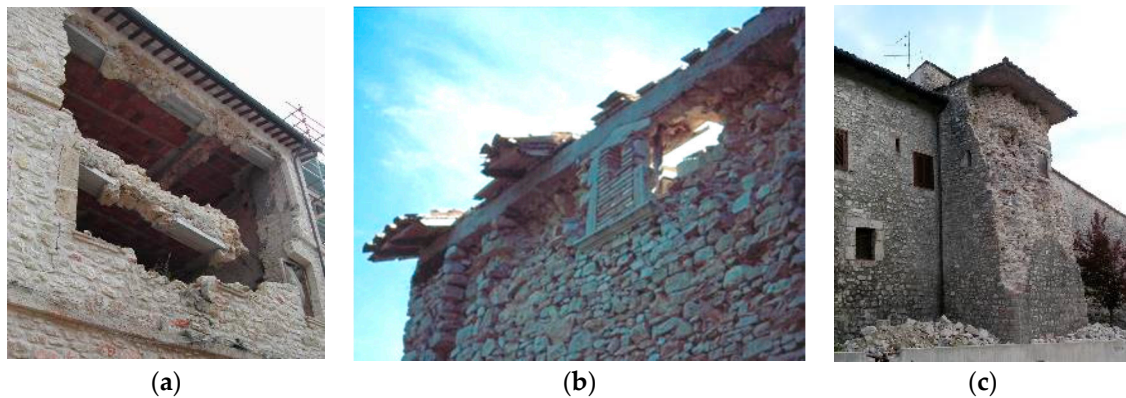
Example of damaged load bearing masonry walls due to the hammering of: (a) r.c. tie beam at floors level; and (b,c) at roof level.
